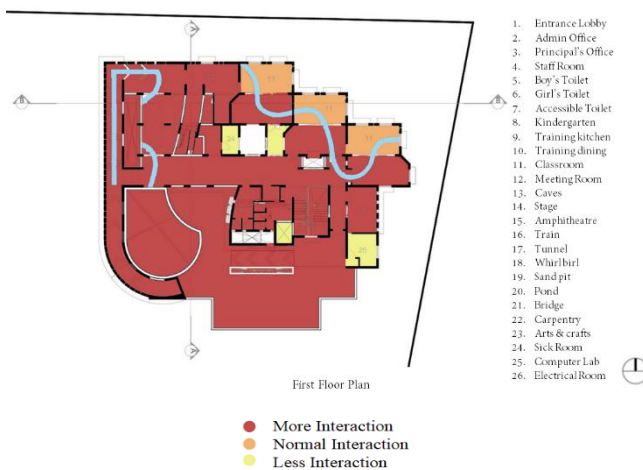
First Floor Plan indicating interaction rate. (Source: Author, 2023)
